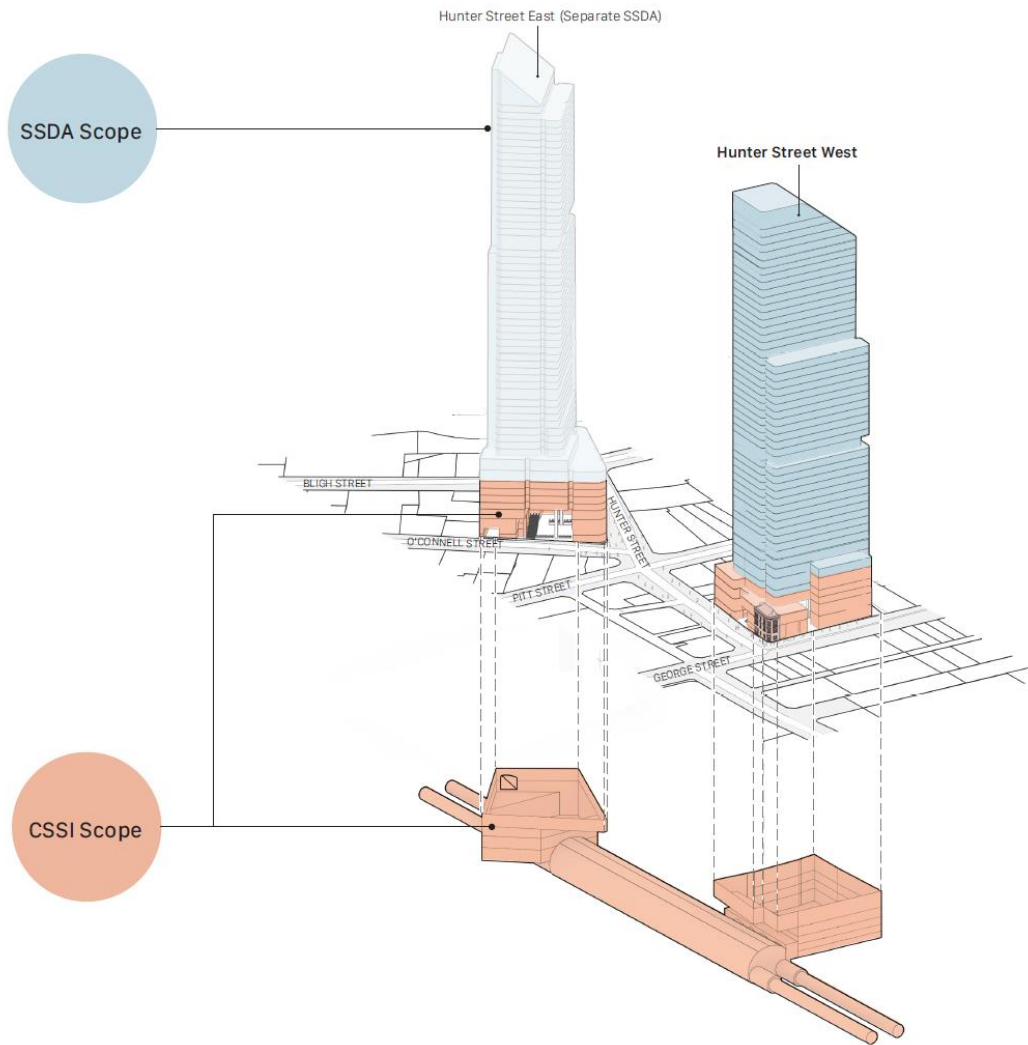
Proposed Concept SSDA development and CSSI scope
